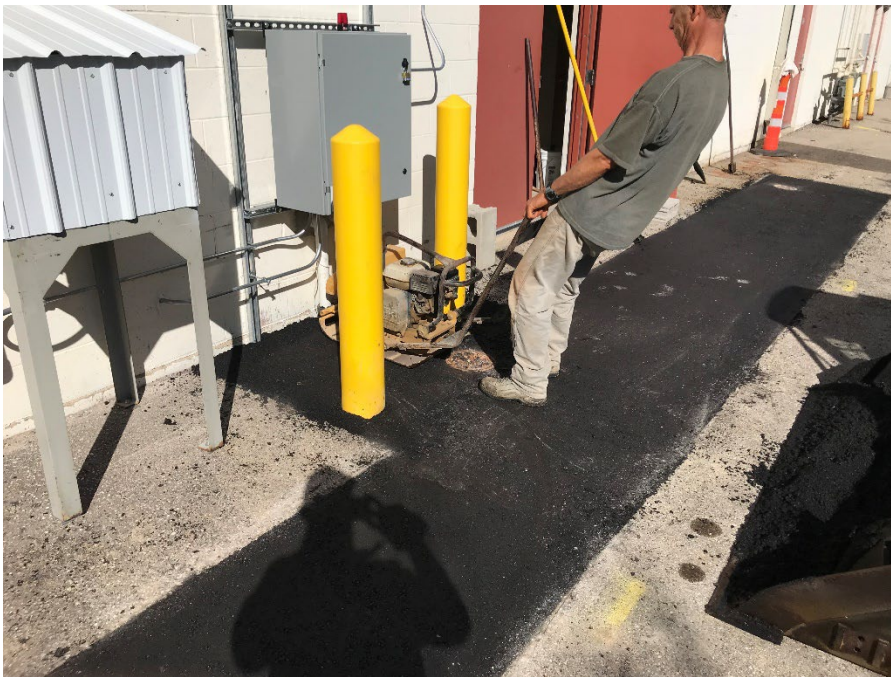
Compacting base course of asphalt in SVE piping trench using plate compactor.
